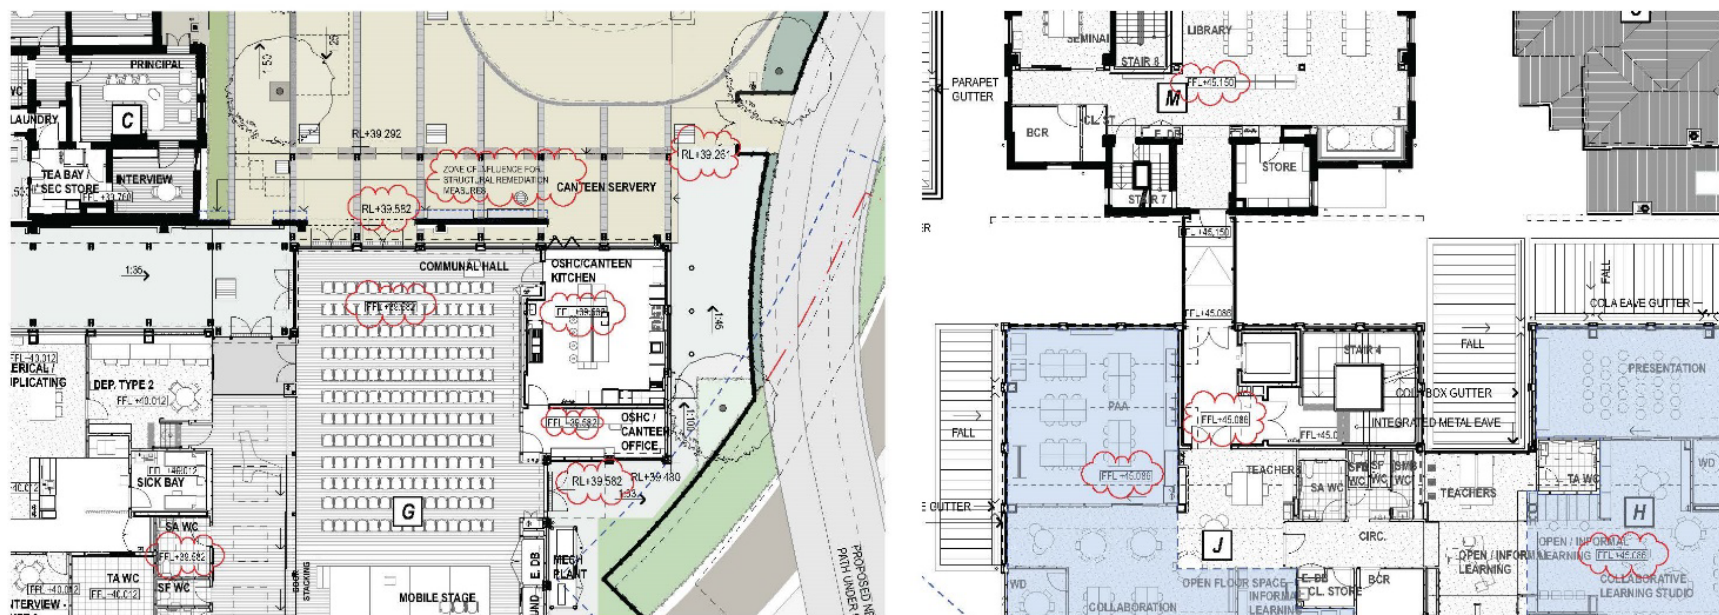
Proposed floor level amendments in Building G, H and J. Source. FJMT, 17 October 2022.
